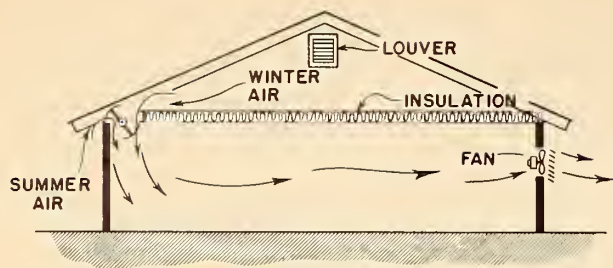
Fan on sidewall drawing air from attic in winter. In summer, attic space is closed and outdoor air is brought into house through slot opening at eave.
